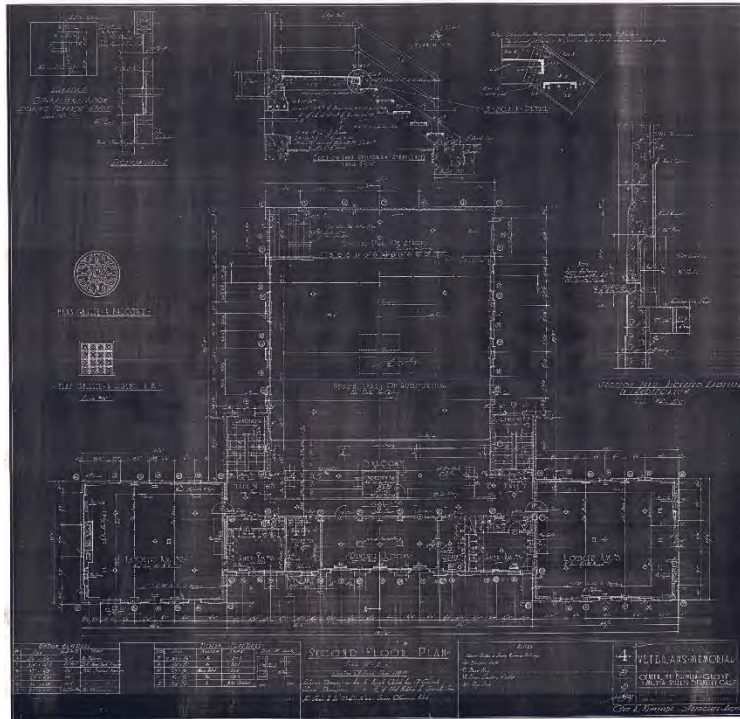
Existing Building drawings – 2<sup>nd</sup> Floor Plan
